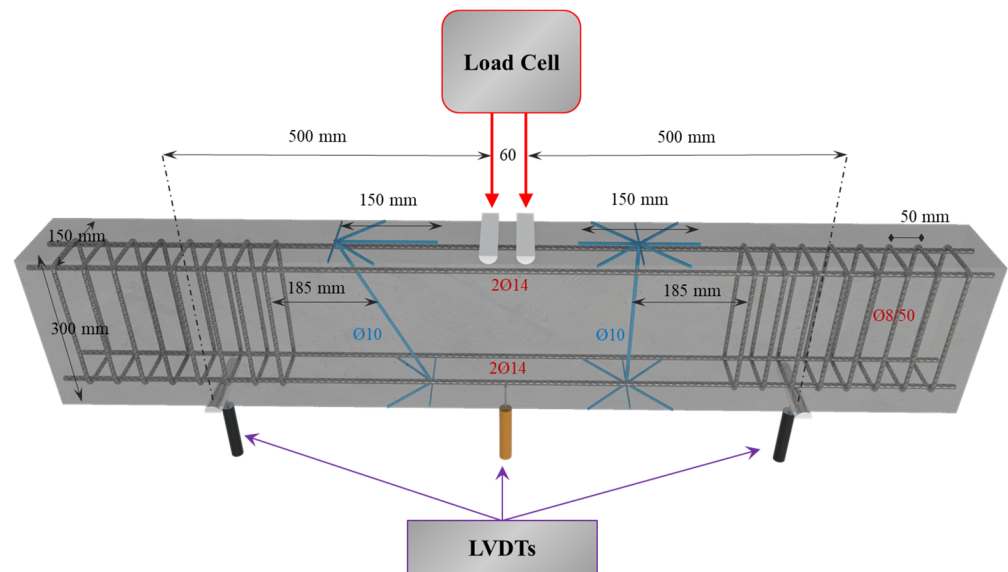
Geometry and reinforcement details of the beam R-Deep Beam.
